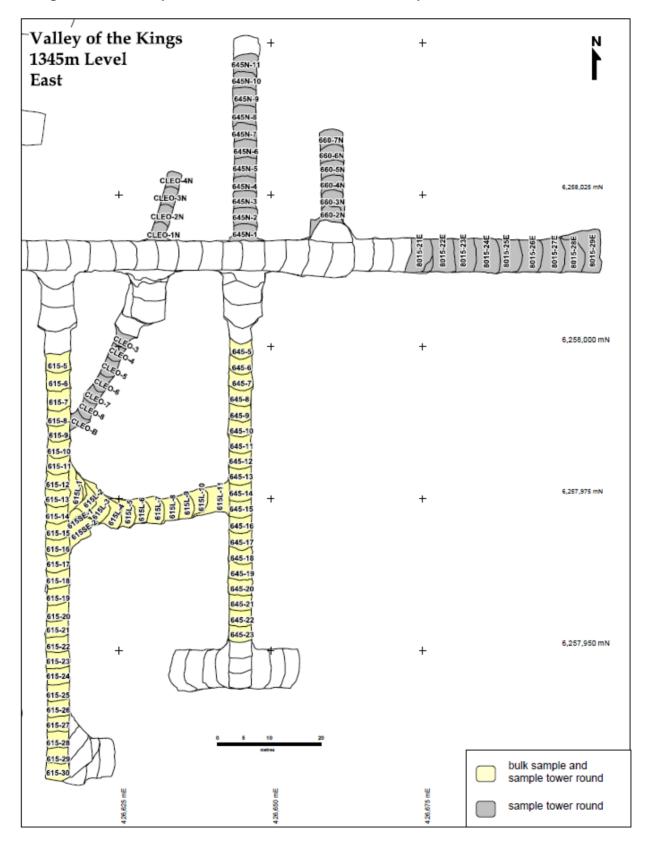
Sample tower round details – 1345 m level plan - eastern side
